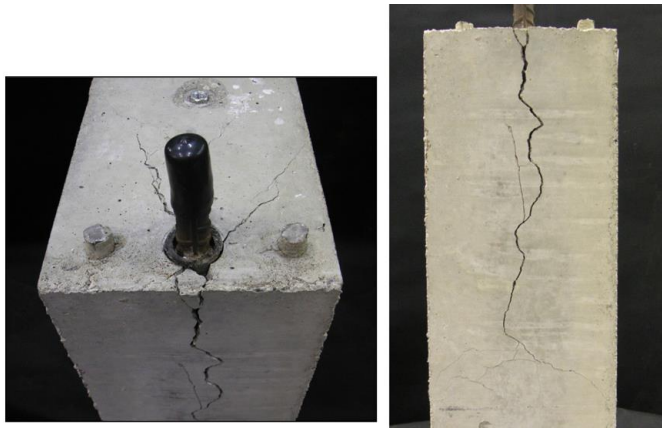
Typical splitting failure of a beam end specimen [105]
